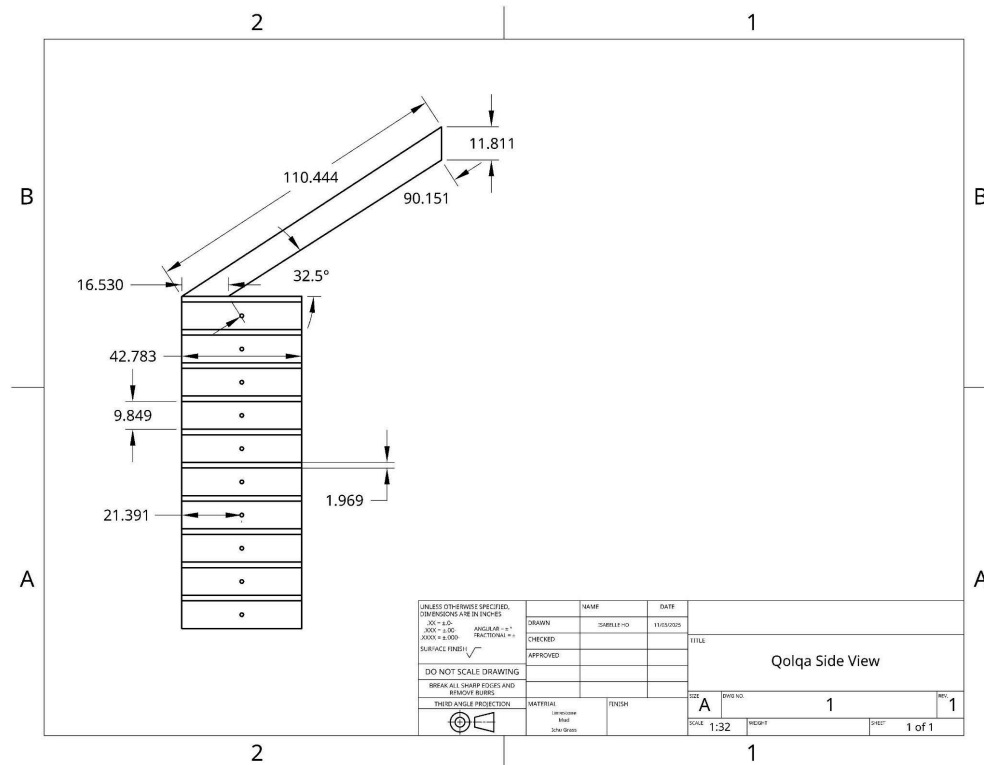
This shows the dimensioned technical drawing of the setup we will use in Comsol.
